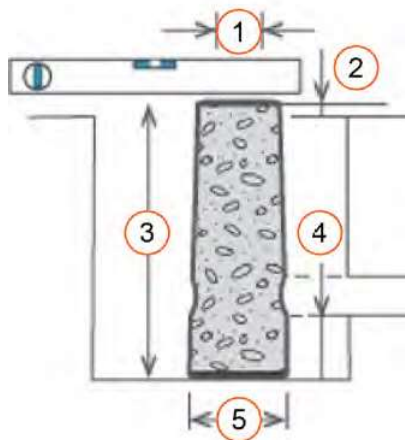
Indicative drawing for Satellite concrete foundation (standard installation flange)
